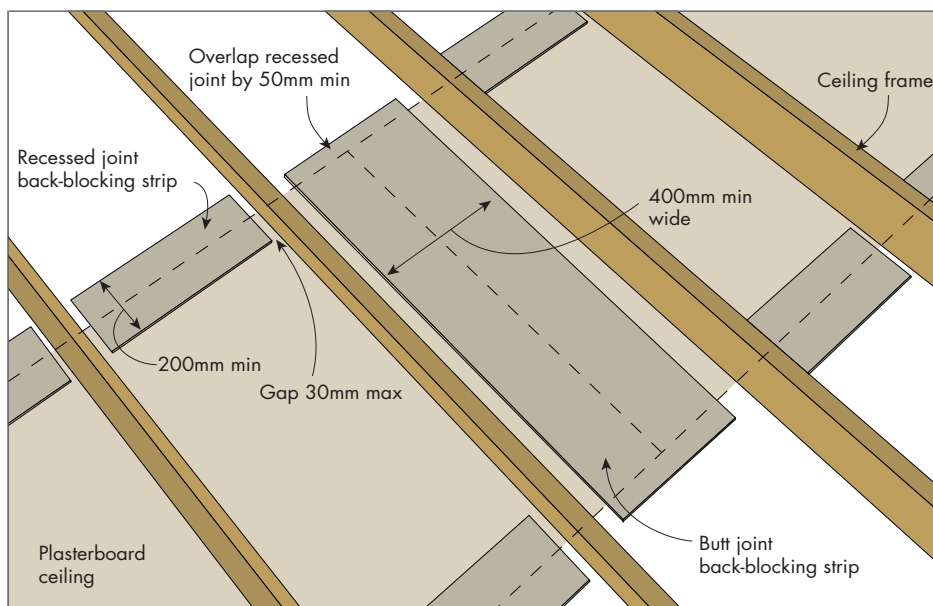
Placement of Back-Blocking Strips For Recessed and Butt Joints
